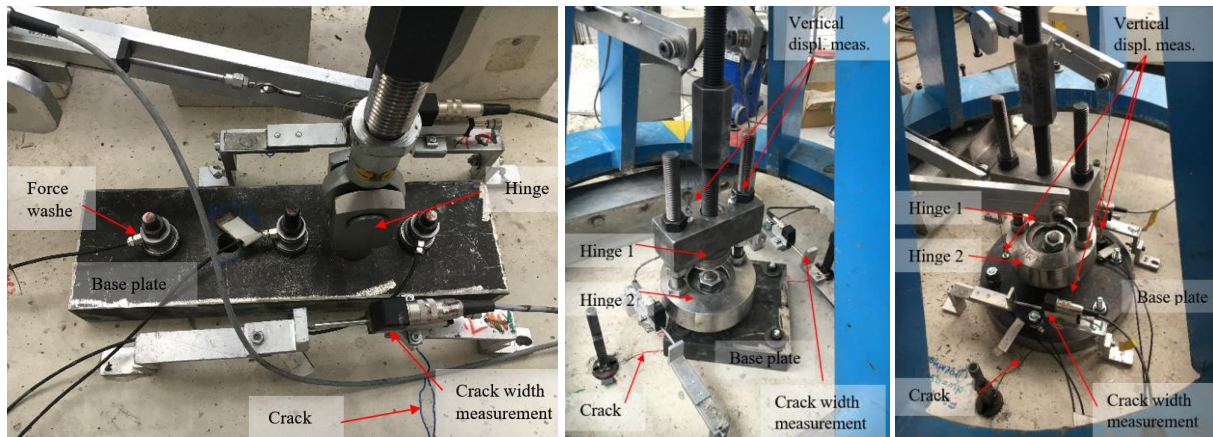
Typical test setup for tension loaded anchor group - eccentric loading in cracked concrete
